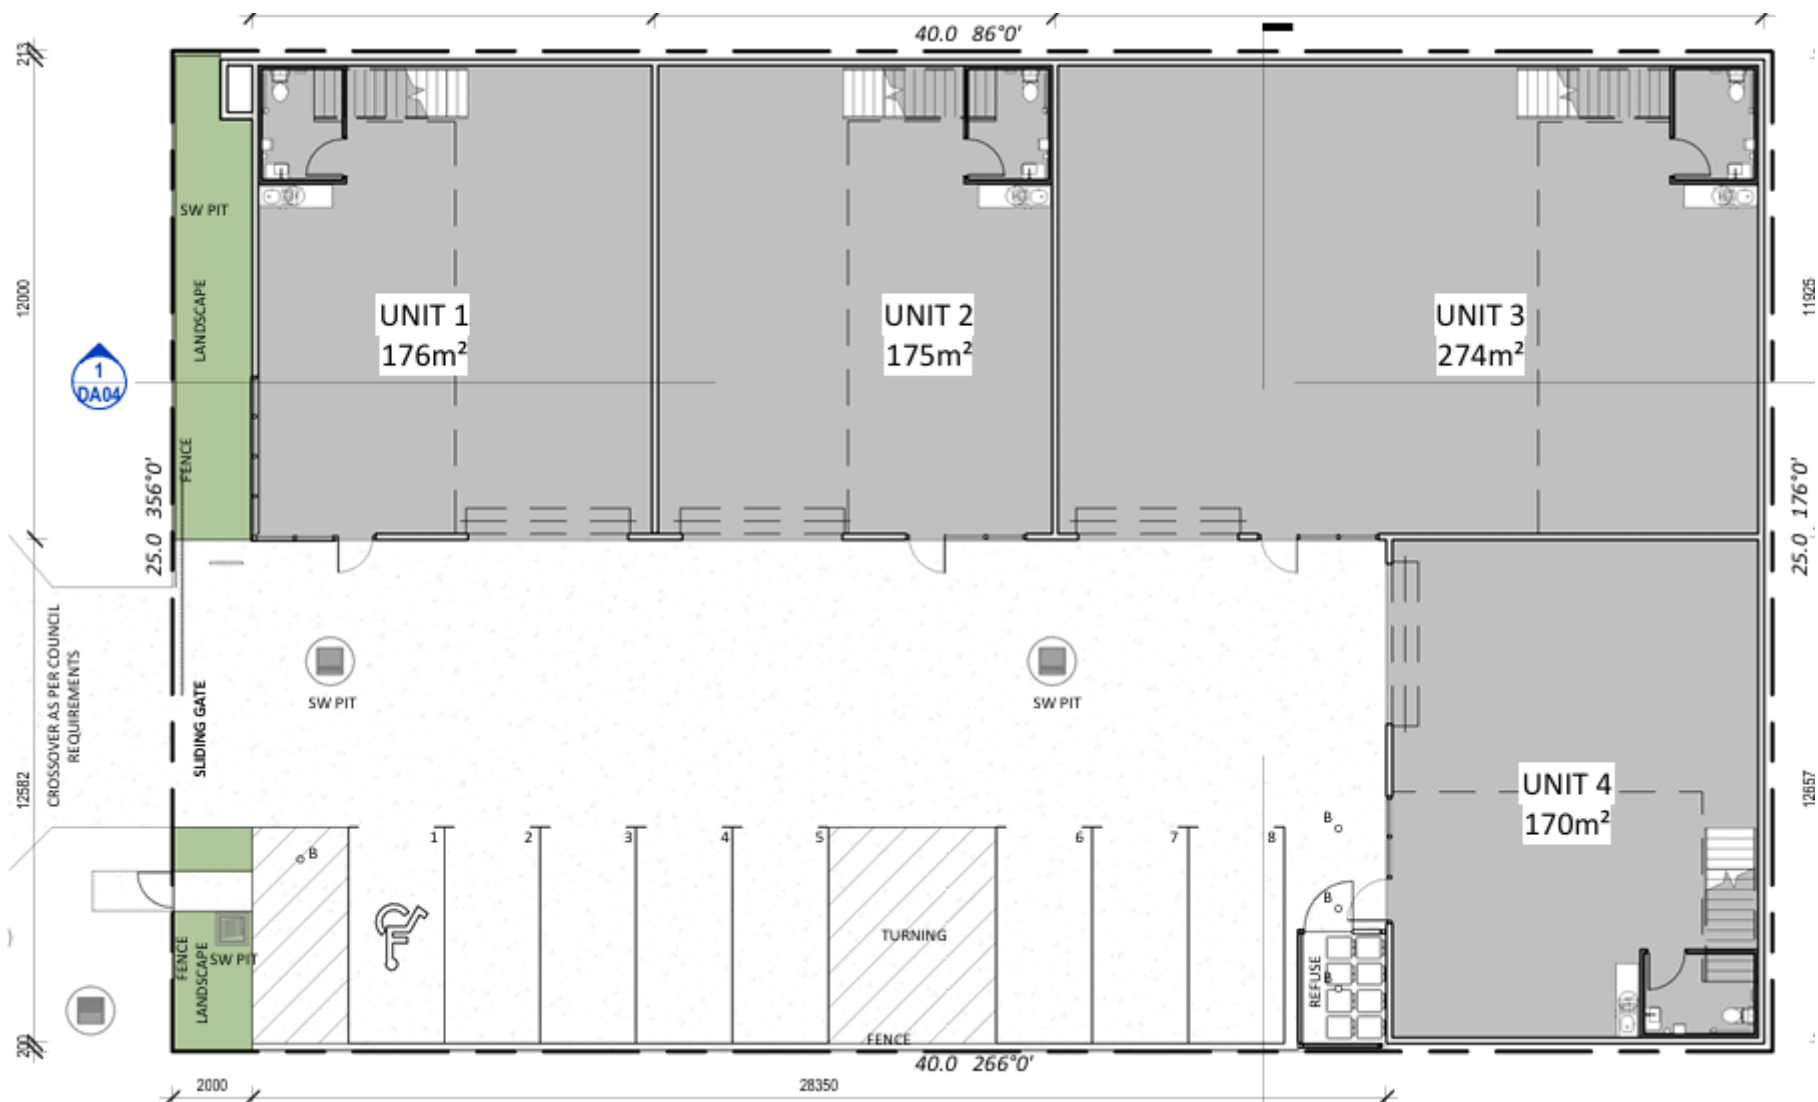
PROPOSED GROUND FLOOR PLAN
